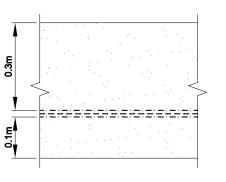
TYPICAL PIPE BENCH SECTION NTS
